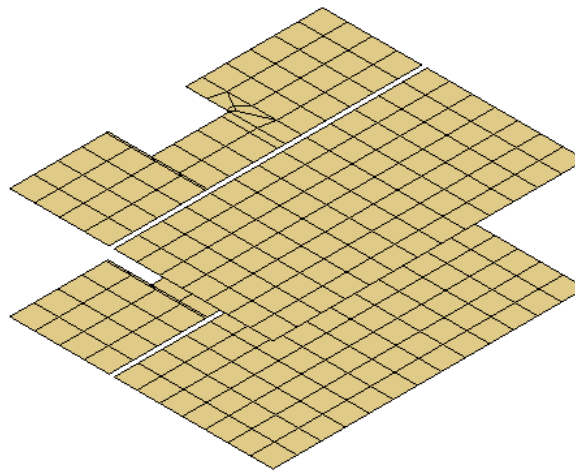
MODELLING OF TIMBER FLOORS
